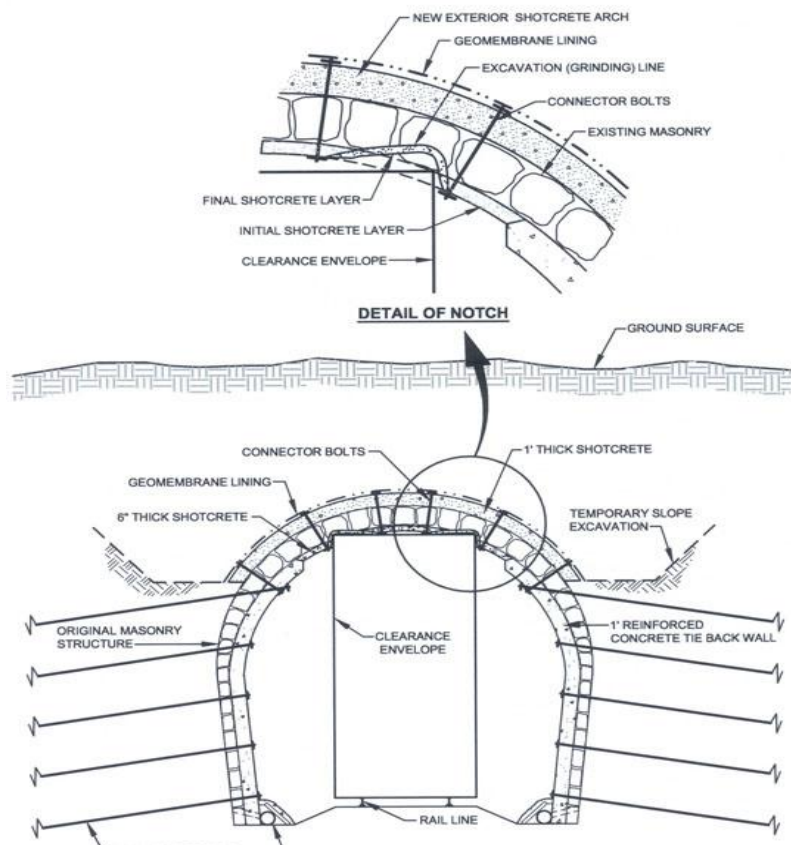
White Haven Tunnel Clearance Improvement at Portal
